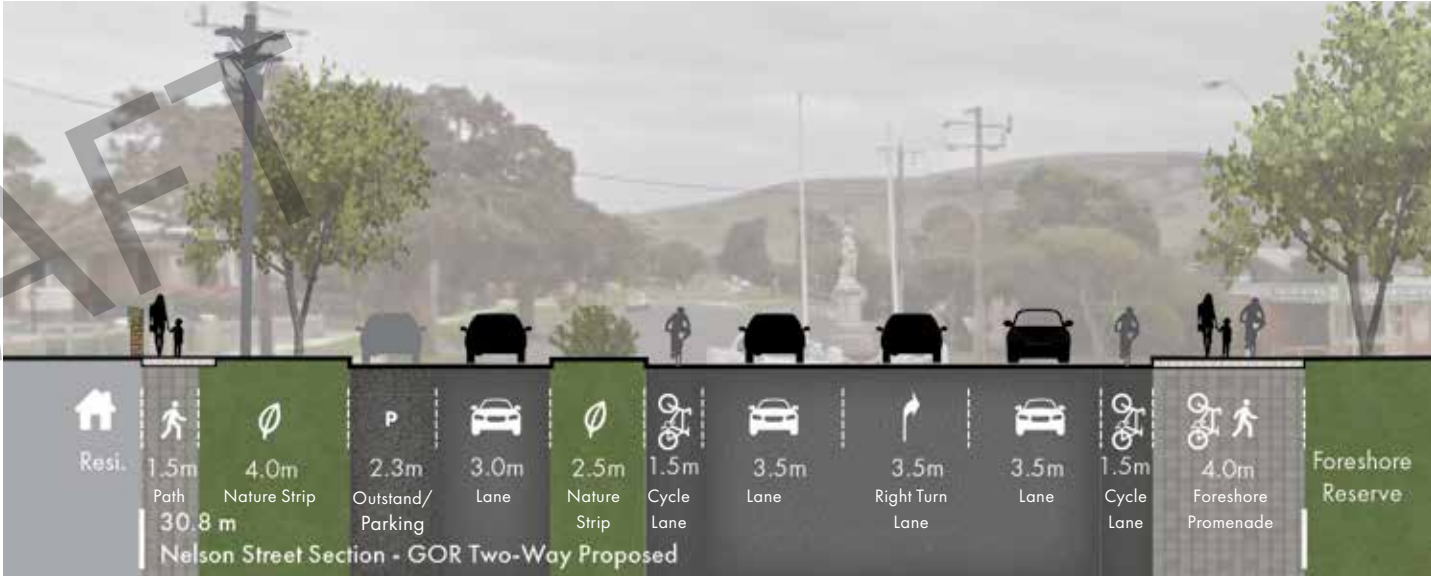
Great Ocean Road (Nelson Street to Nelson Street) A-A' Two-Way - Proposed
